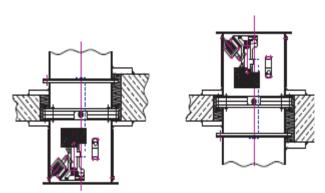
Imbedding square fire damper in the ceiling with Rockwool
